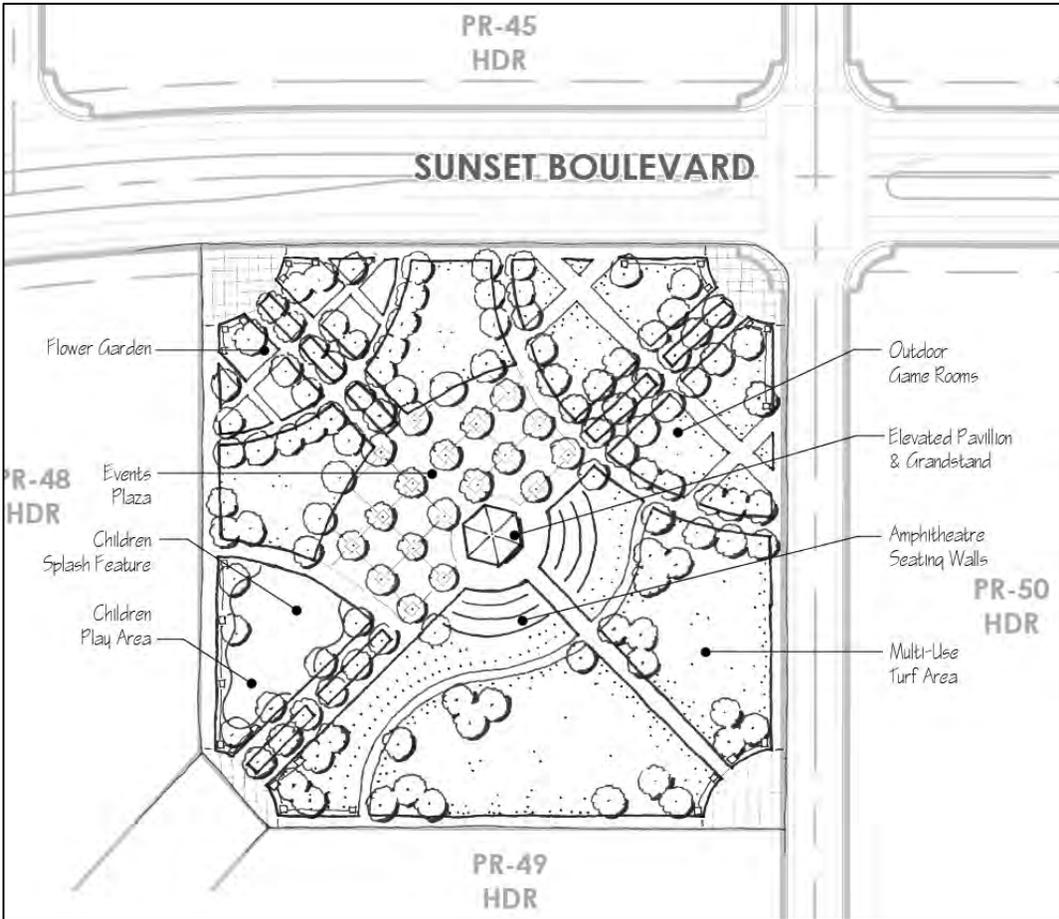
CONCEPT PLAN FOR PARK SITE PR-104
